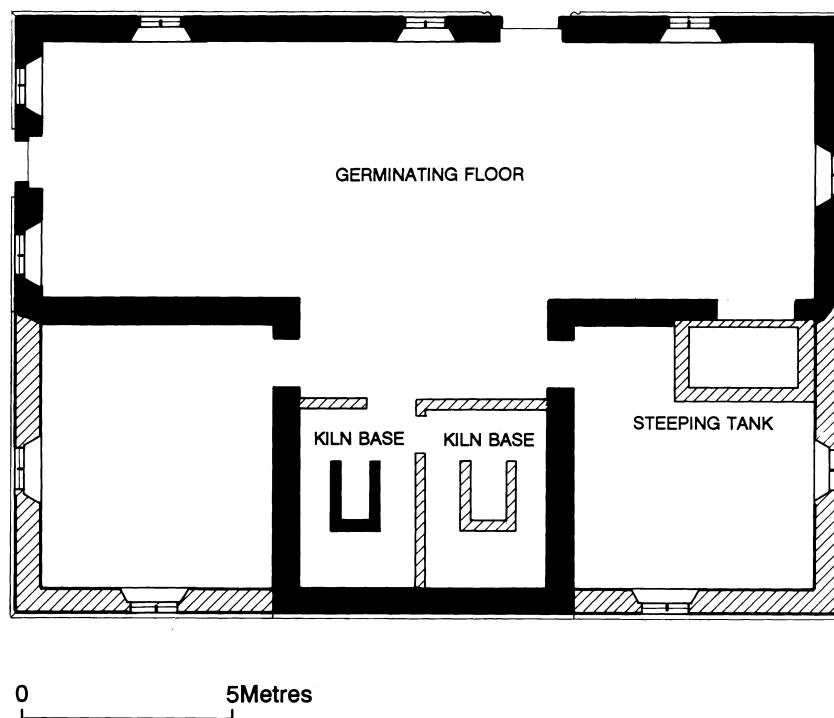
Madeley Court barn: ground floor plan, Phases 1 and 2.
